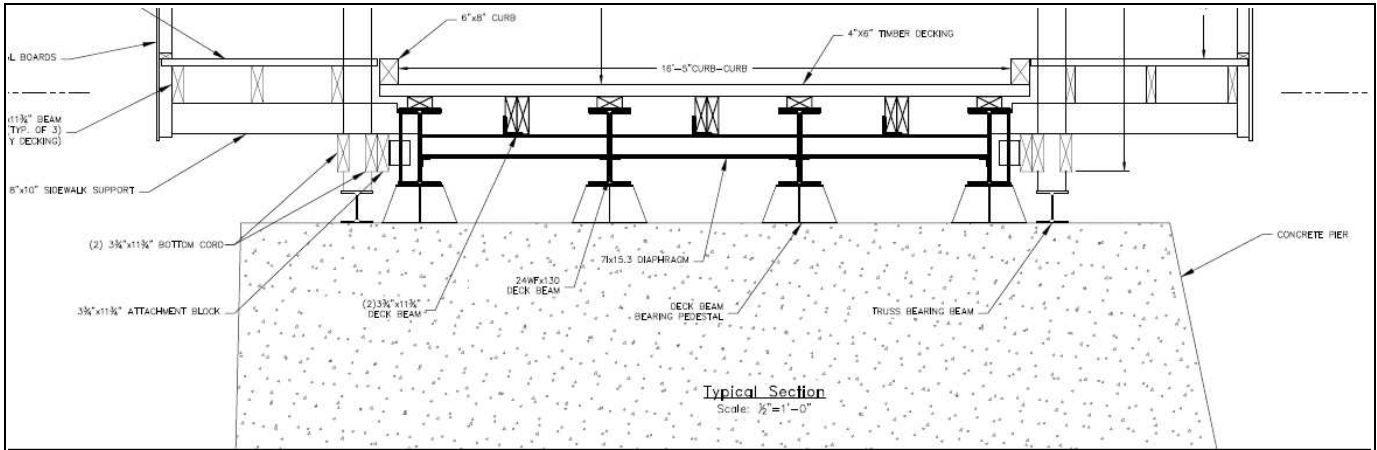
Section thru concrete pier showing existing conditions. (Source: HEB 2012).
